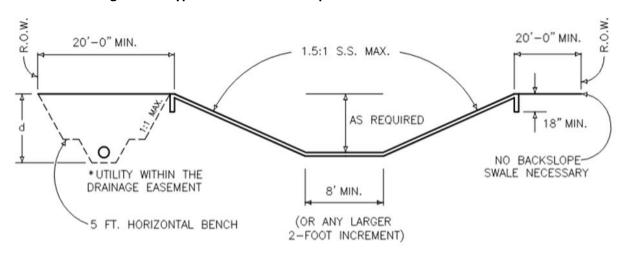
Typical Cross-Section Trapezoidal Concrete-Lined Channel
